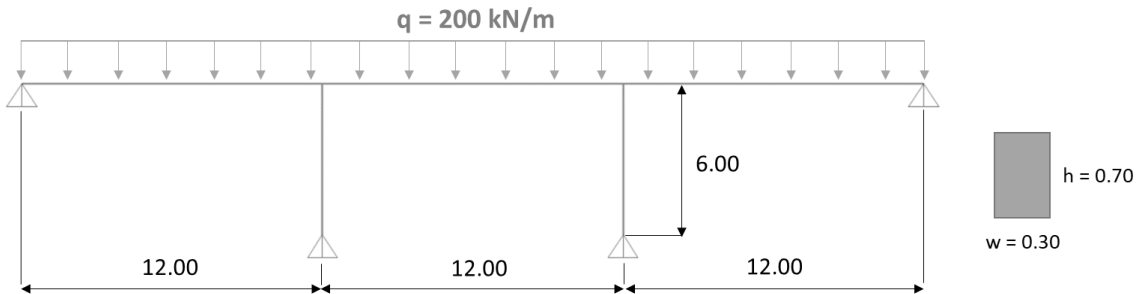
Elevation view of the frame-type structure and cross-section for both columns and beams. Dimensions are in meters.
